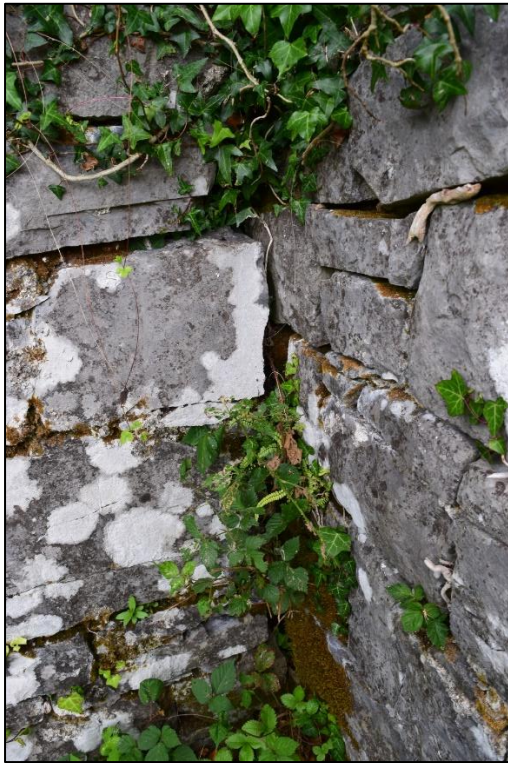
Masonry join of south transept with south elevation of nave showing no signs of masonry ties, suggesting the transept is a later addition.
